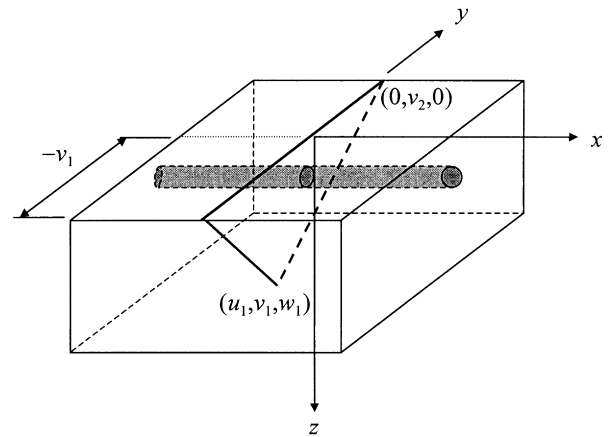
Reinforced concrete block with a surface-opening crack.
